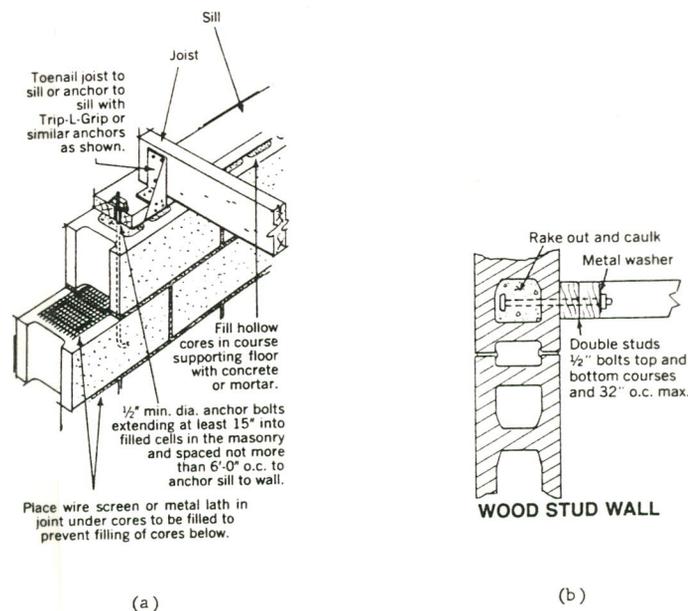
Application of anchor bolt for masonry connection: (a) connection of sill plate to concrete masonry bearing wall, (b) connection of concrete masonry wall to wood stud wall (NBS, 1977)
